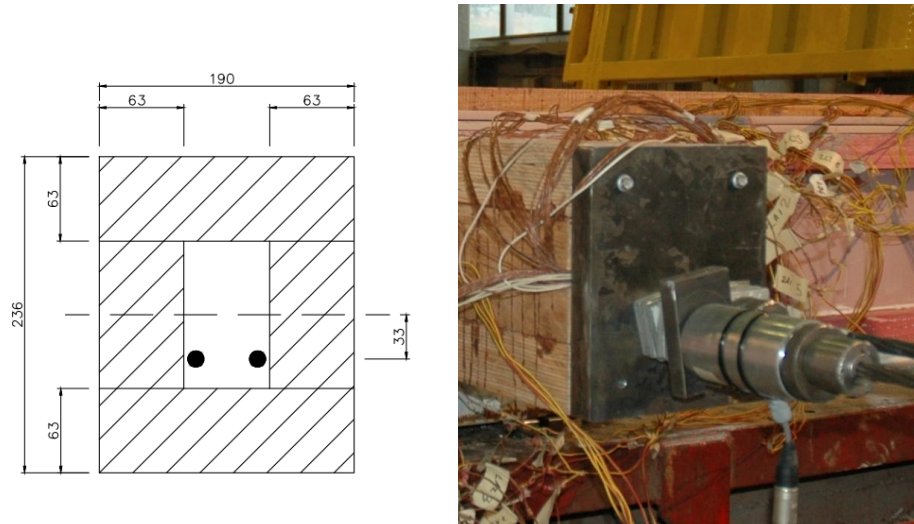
Beam B - LVL cross section (left). Photo of completed beam showing post-tensioning anchorage (right)
